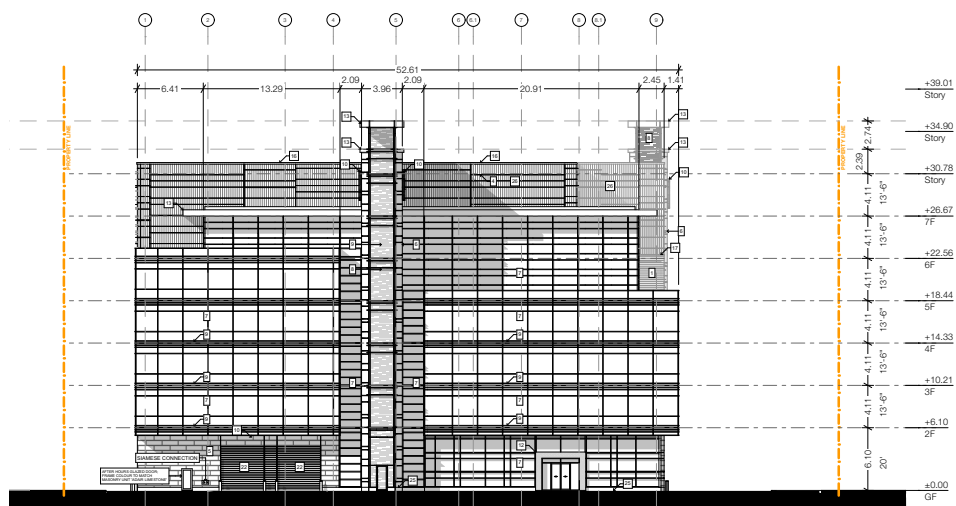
East Elevation of the proposed building by TACT Architecture Inc.
